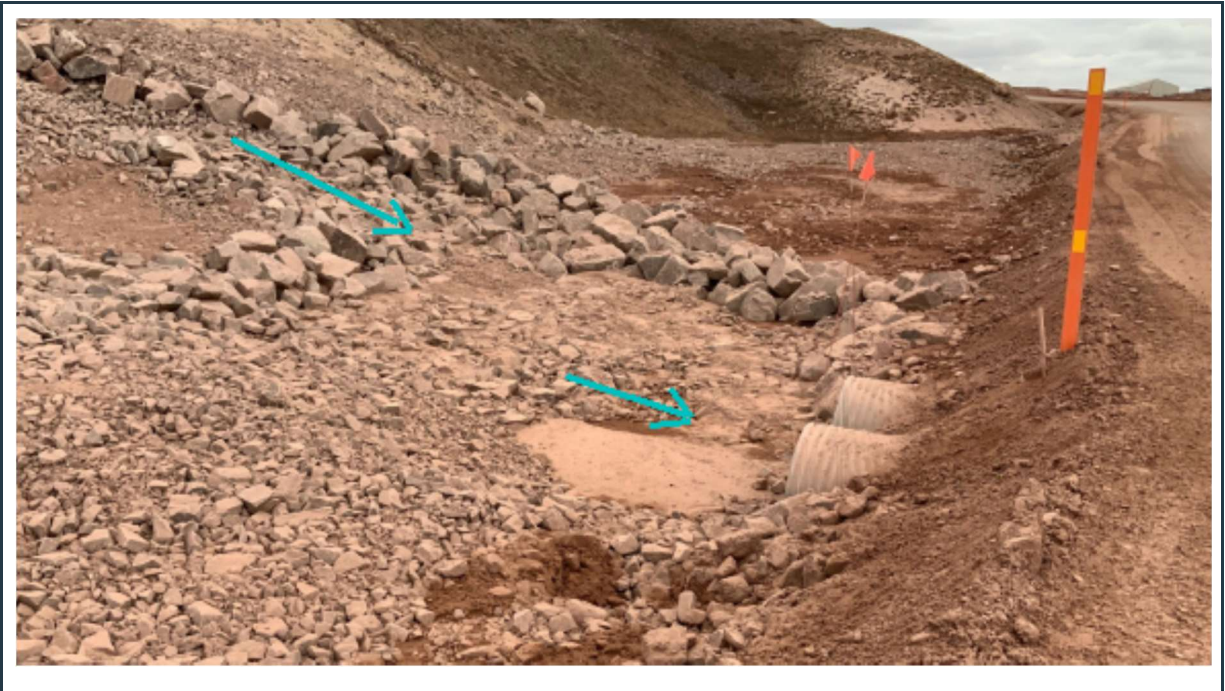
View of twin culverts, draining surface water from the quarry area under the tote road (inlet).
